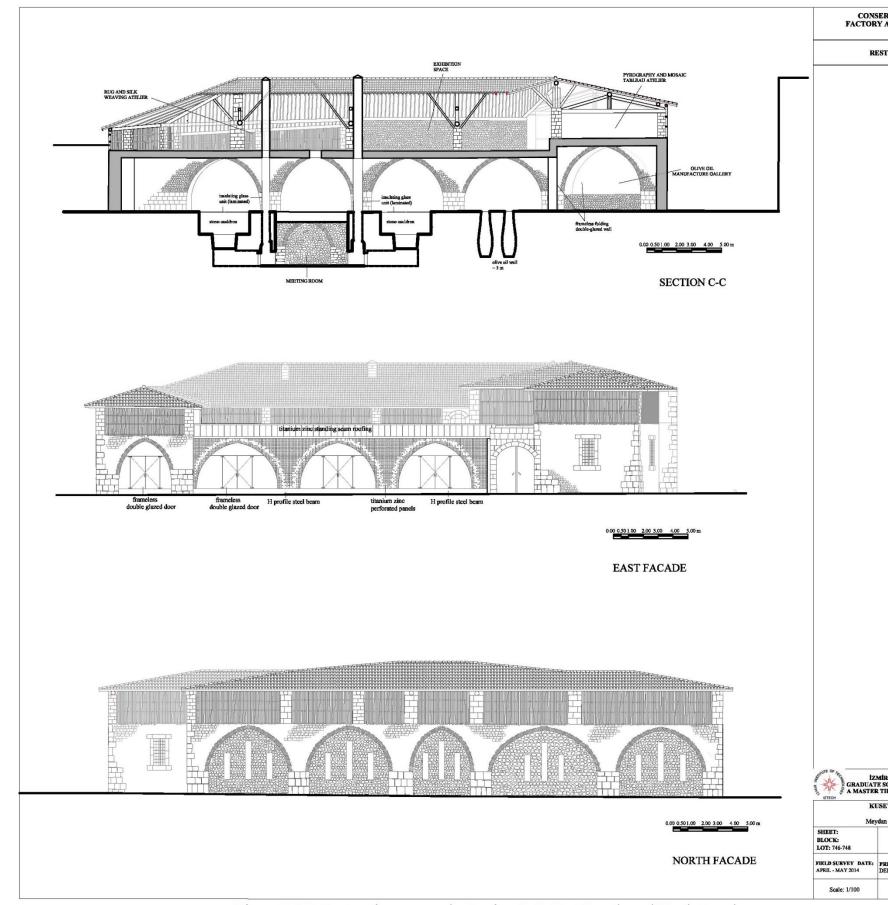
Restoration proposal – Section C-C, East Facade and North Facade
